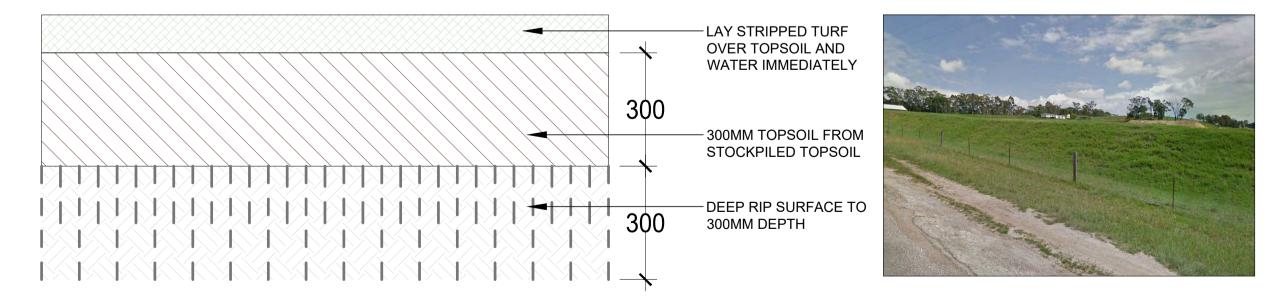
TEMPORARY BUND WALL SECTION
